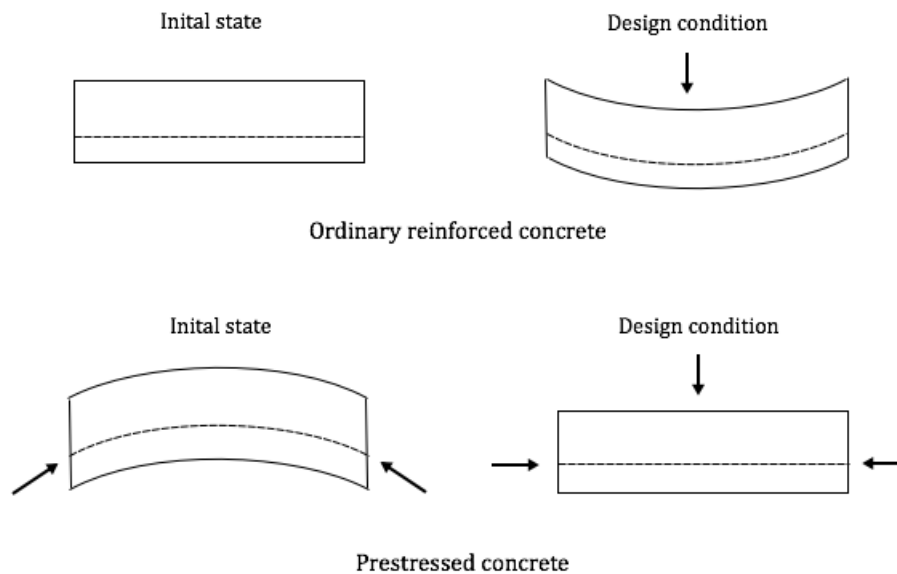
Behavior of a reinforced concrete beam versus a prestressed concrete beam.
